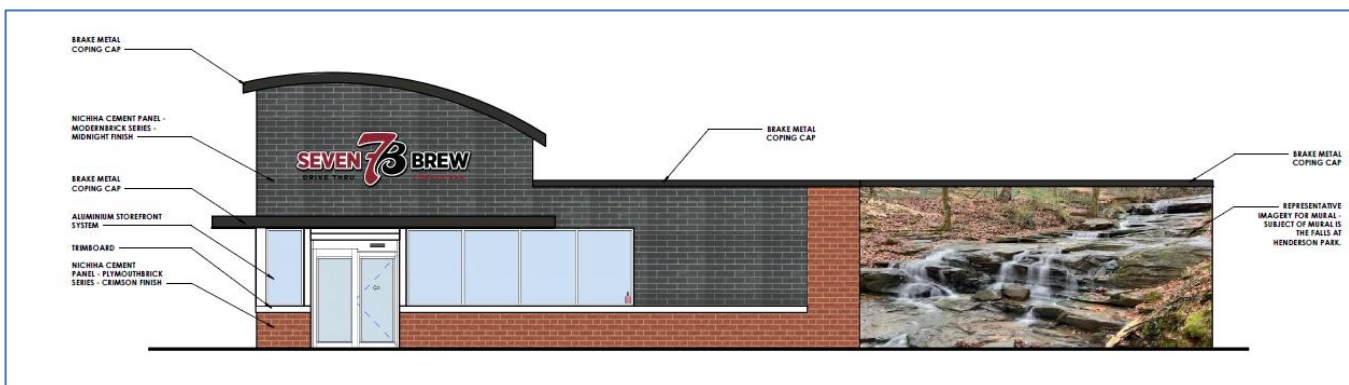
Proposed northern elevation, including walk-up entry and mural facing Lynburn Drive.
